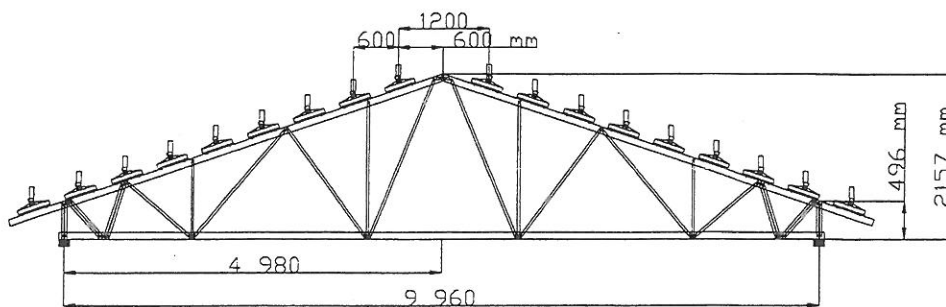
Nominal Geometry of Test Truss with Load Cylinders.
